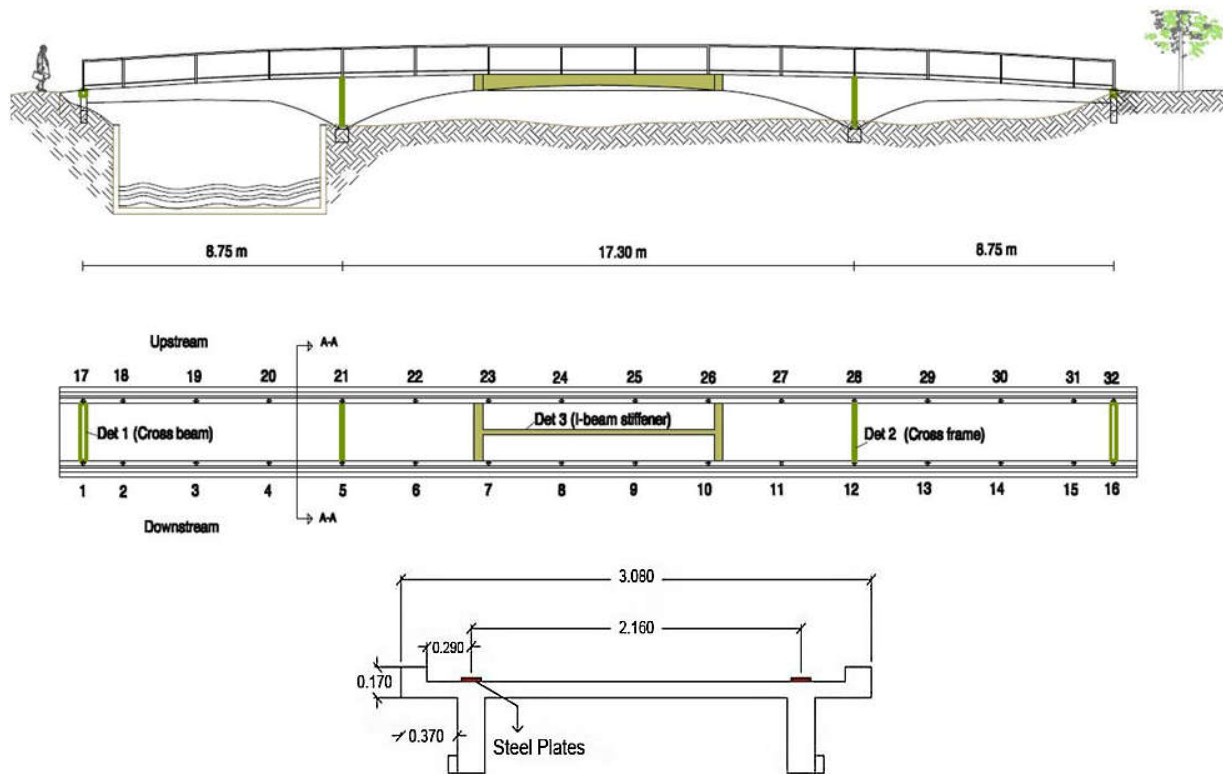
Elevation-longitudinal section, plan and cross-section (section AA) views of footbridge.
